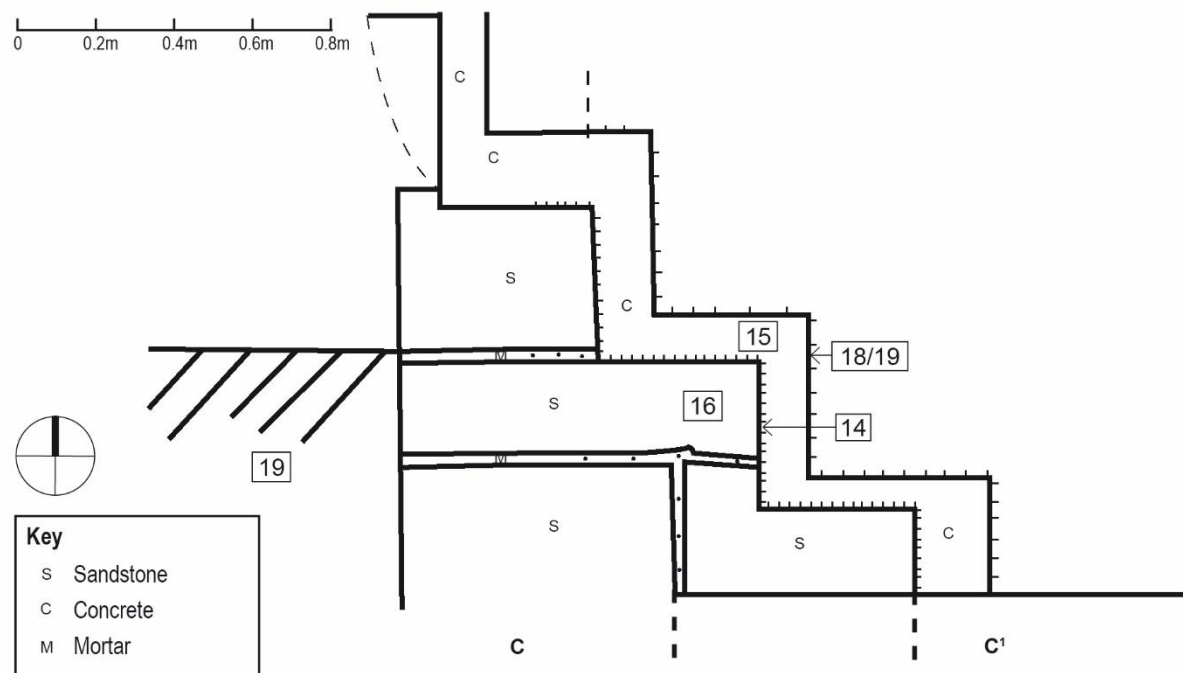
Eastern face of the sandstone and concrete steps, section plan. (Source: GML 2019)
